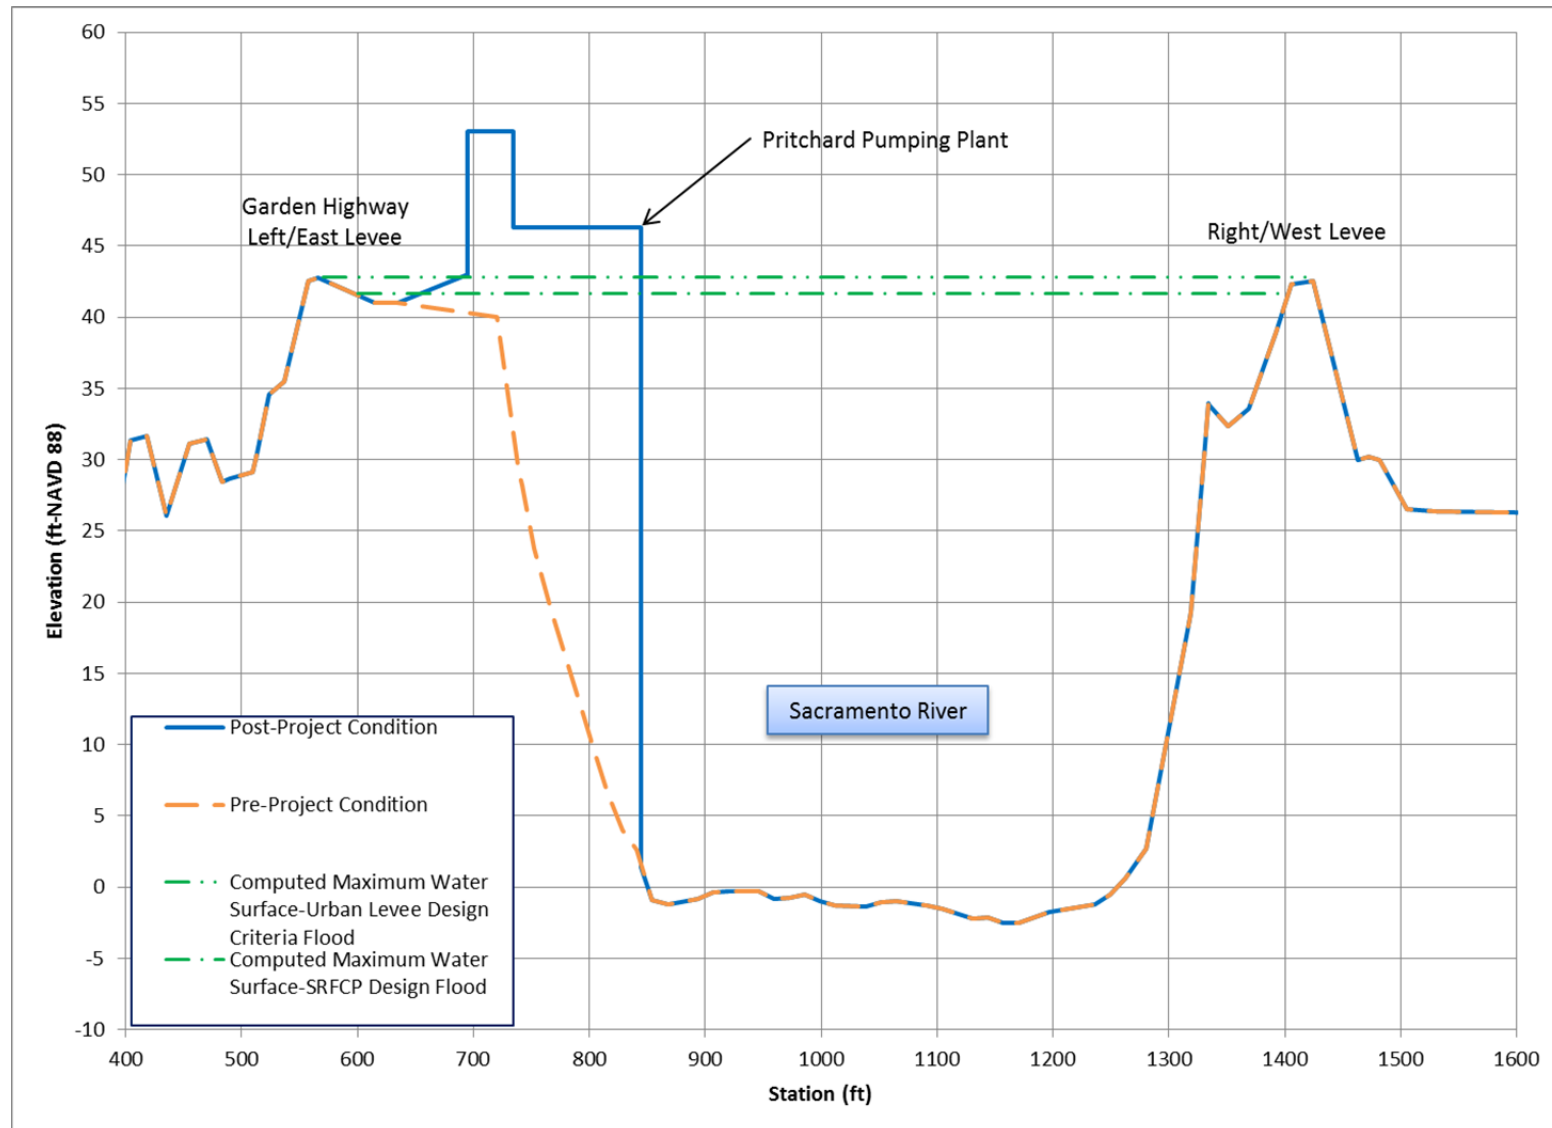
Pre-Project and Post-Project Cross-Section at Pritchard Pumping Plant (looking downstream)
